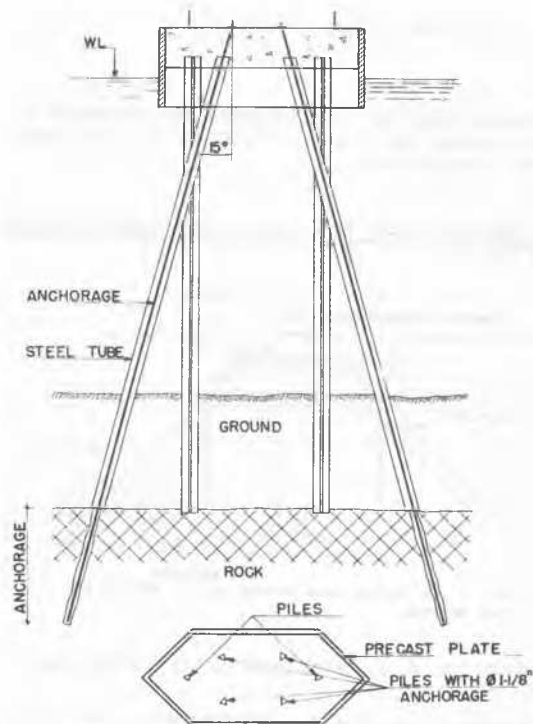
PORT OF JUAZEIRO - BAHIA - ANCHORED PILES FOR THE FOUNDATION OF THE PIER SUPPORTING THE CONVEYOR BELT
